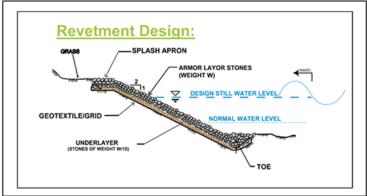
Typical cross-section of revetment after FHWA guidelines.
